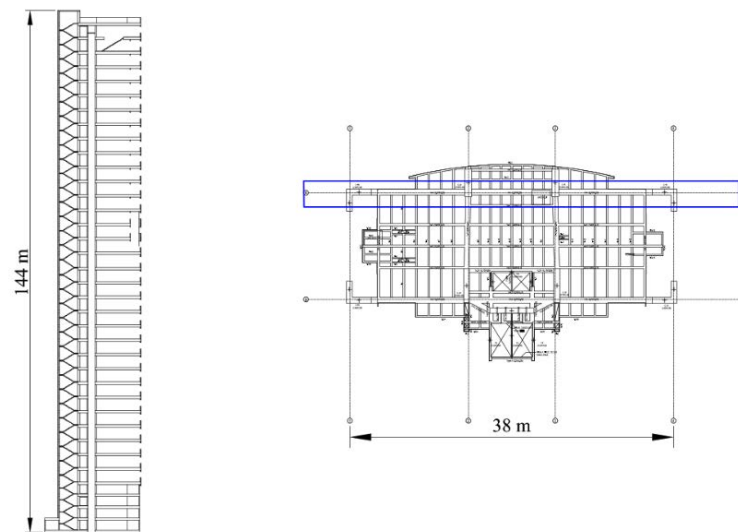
Elevation and plan view of *Cantagirone Tre Piú* building.
